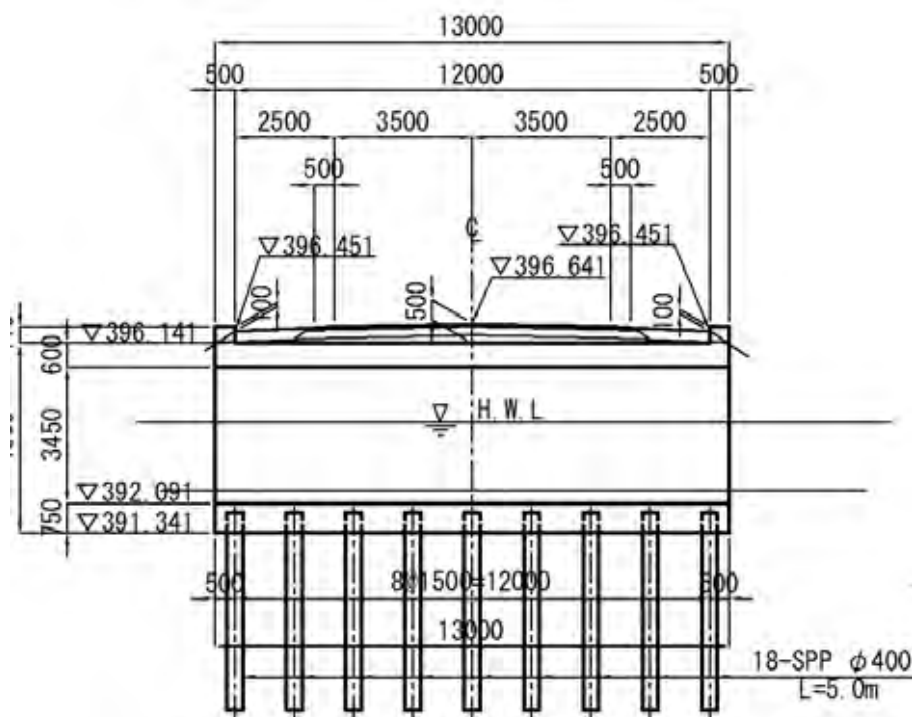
Sectional Profile of Reinforced Concrete Rigid Frame Bridge
